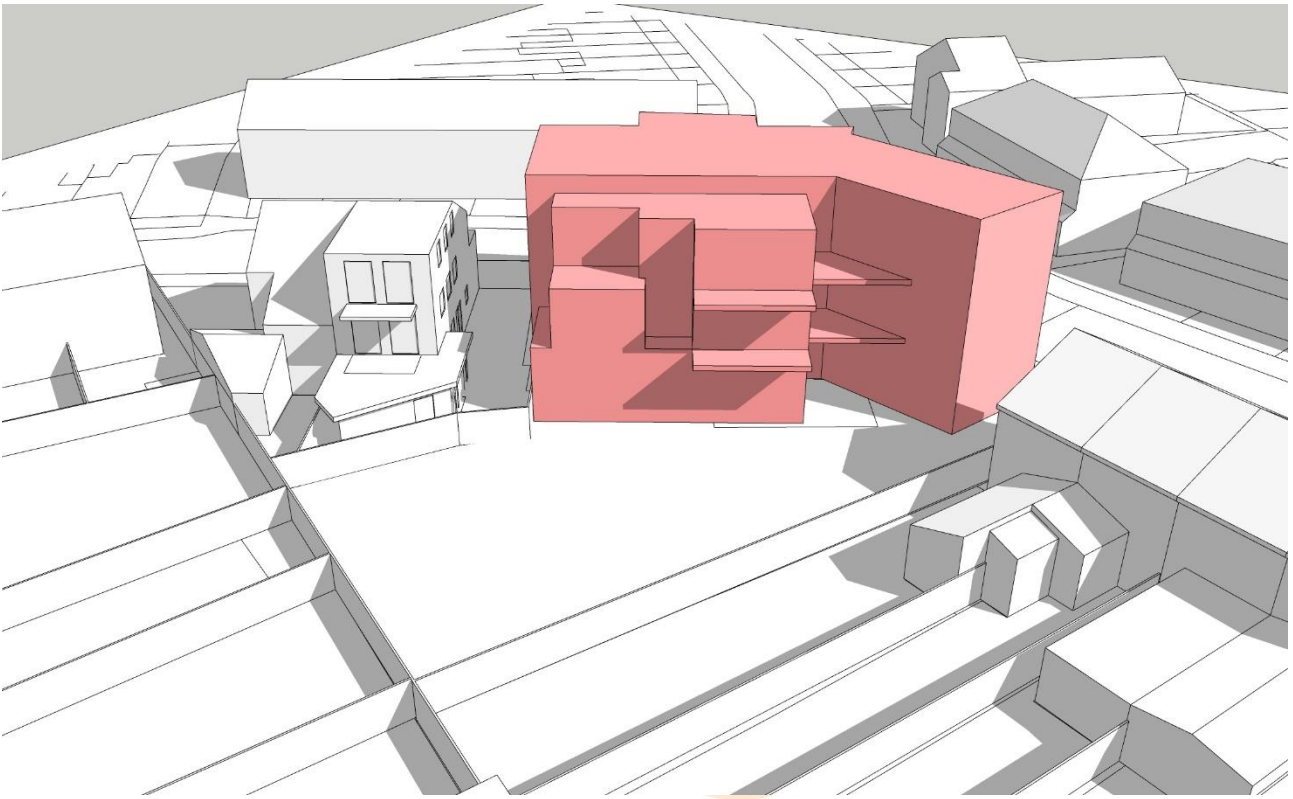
As proposed model viewed from South West. Shadows set to 12pm, 21st March.
